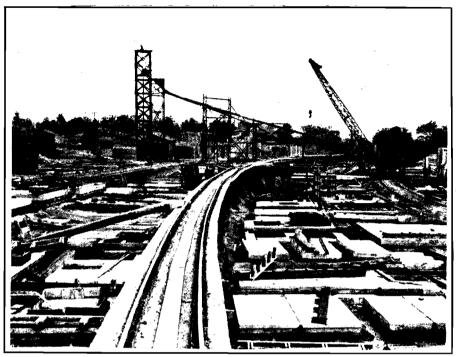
General view of casting yard. Note the trestle track running from the central concrete plant through the yard.
